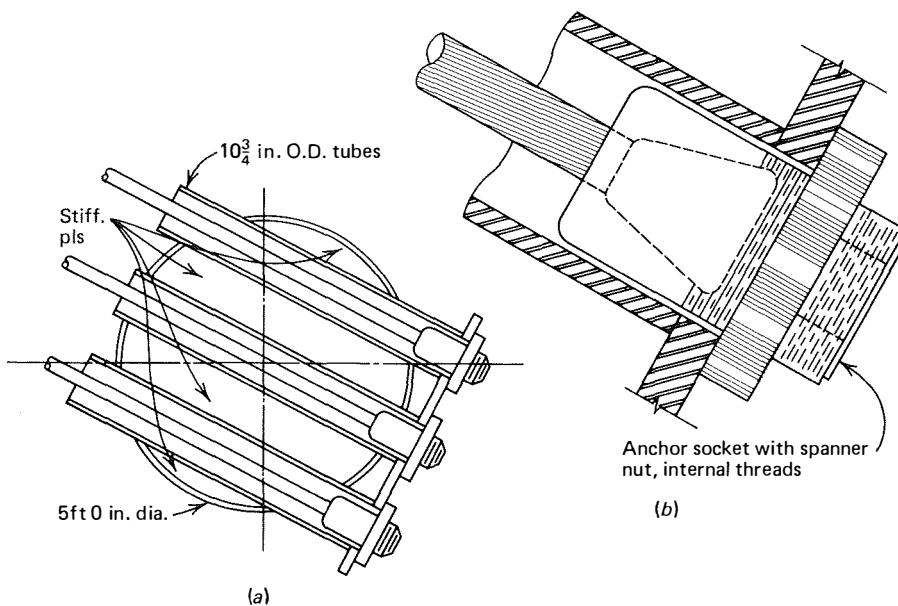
Papineau-Leblanc Bridge, anchorage of web of box girder. (Courtesy of the Canadian Steel Construction Council, from reference 24.)
